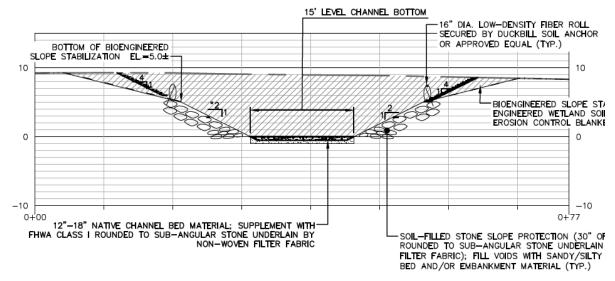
Alternative 3: 15-foot width open channel breach with no roadway overtop.
